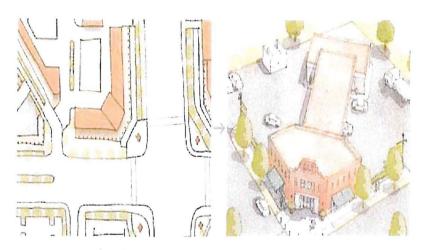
V-11 Redevelopment design suggestion at intersection corner
